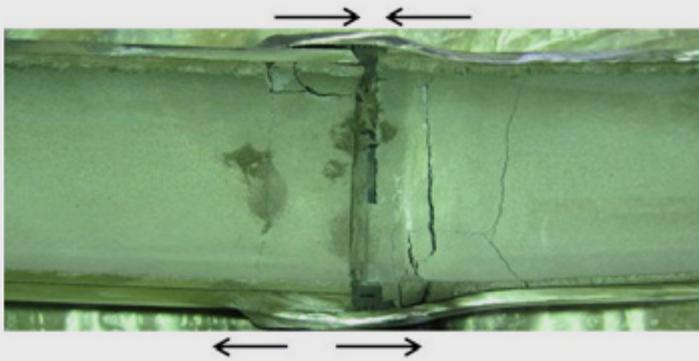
Deformation of the slip welding joint after a bending of $R = 100 \text{ OD}$
